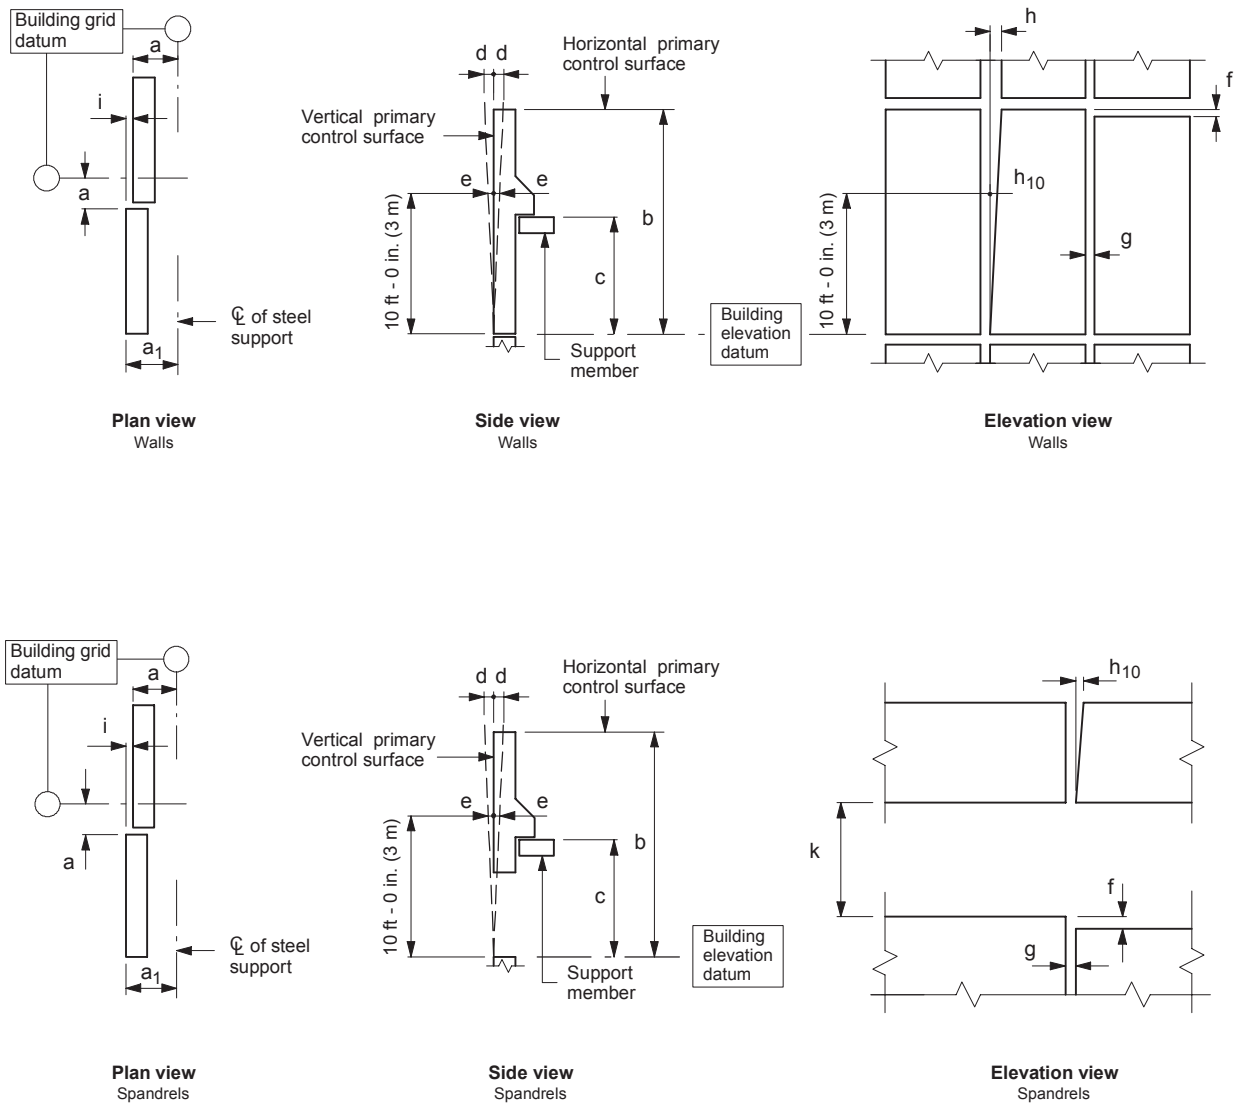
Architectural walls/spandrel erection tolerances (MNL 135, Fig. 12.5.1).
